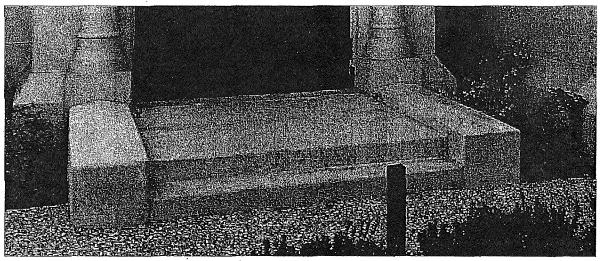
Detail, North portal stairs on east transept. (Page & Turnbull, 05/25/2018)
